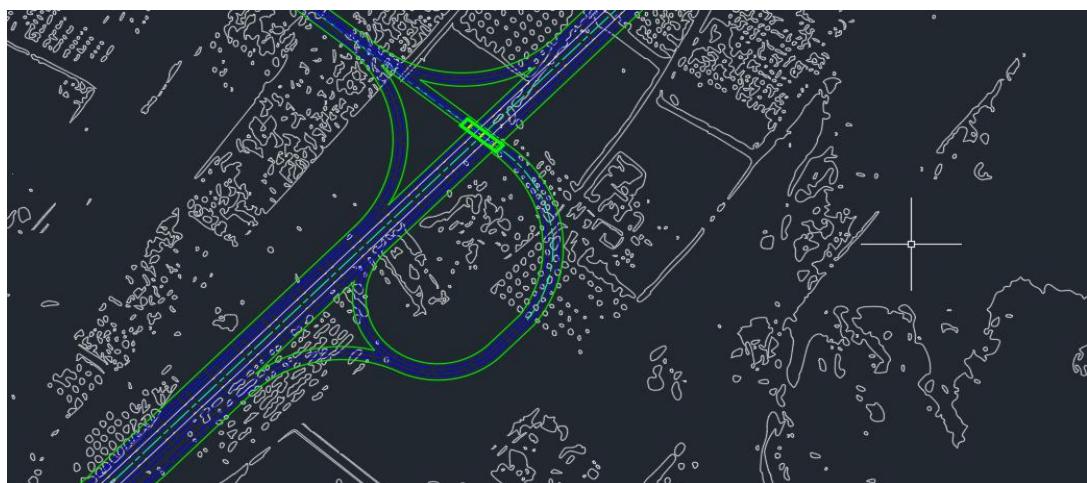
Layout of Variant 2 and its ramps in AutoCAD
